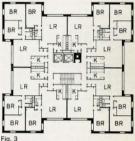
presents a typical floor plan of a soundproof apartment house incorporating most of the recommendations listed before.
